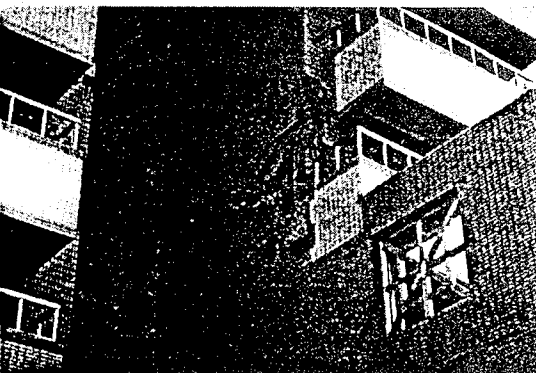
Damage of the middle floor of the high-rise multiple dwelling house (Fengyuan City, Taichung County)
